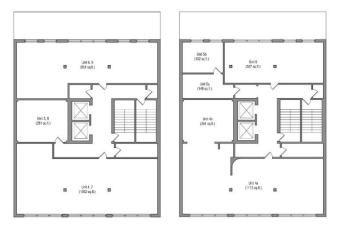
, 231 (left to right, top down): Building 8, second floor (1926); same floor (1981). I'' = 32'. North is to the left.
